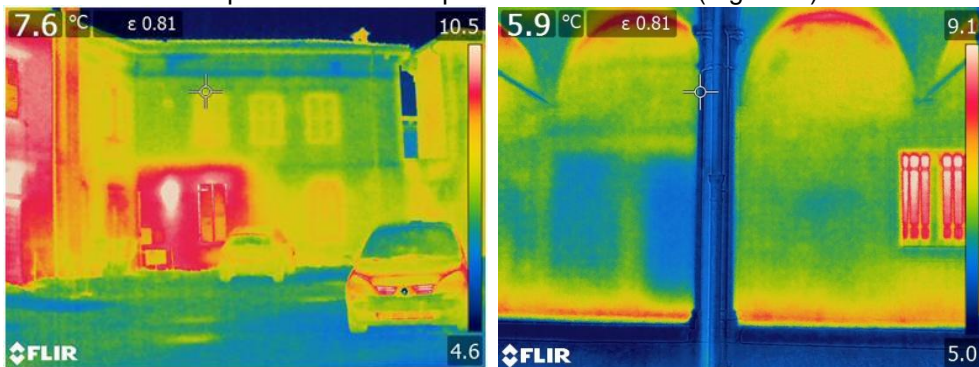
Identification of different structural elements, concrete stringcourse (left) and infill door (right)
